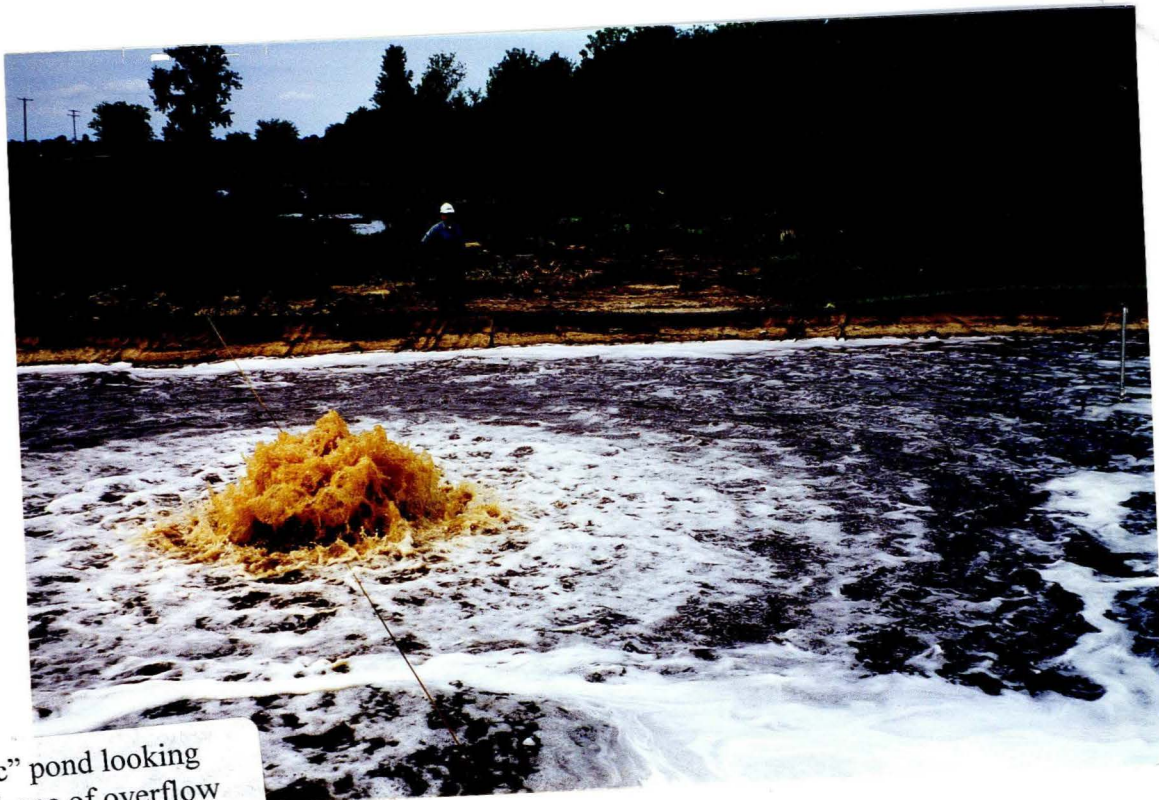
"Plastic" pond looking north. Note evidence of overflow on the north side of the pond.
